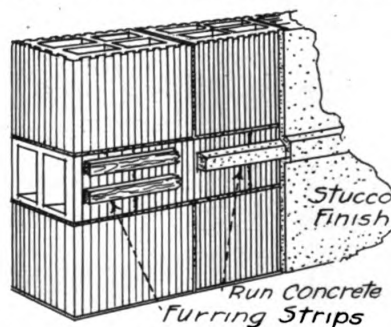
Building a Water Table on Hollow Tile. Two Furring Strips Are Fastened to the Wall, Acting as a Form. The Space Between Them Is Then Filled In With Mortar and the Strips Removed
